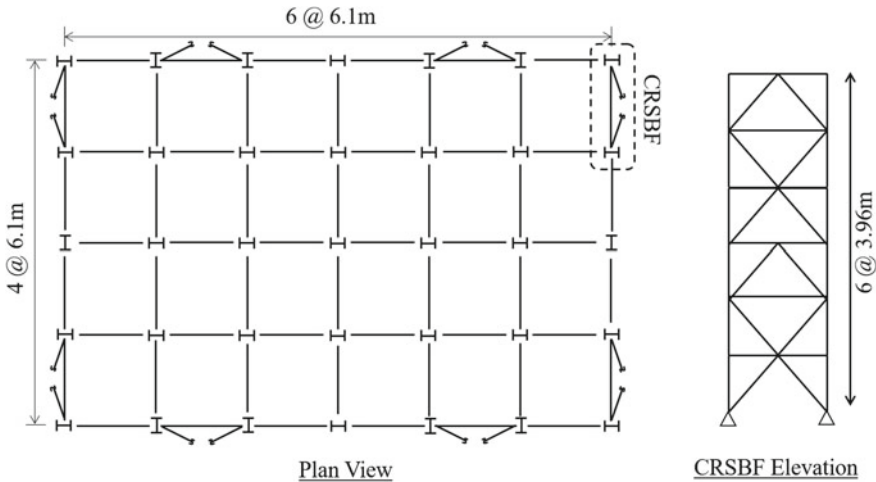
Typical plan view and elevation for CRSBF building (based on Ma et al. 2011)
